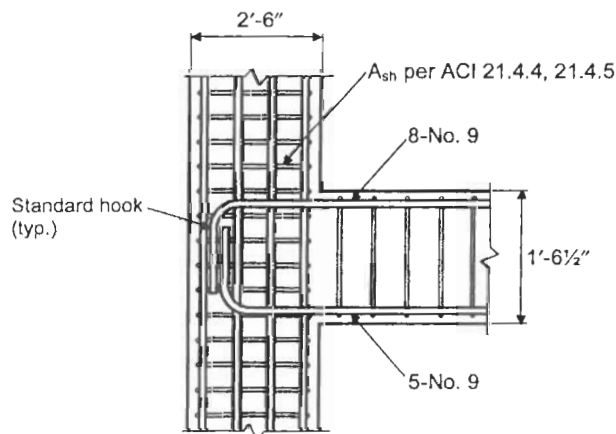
Reinforcement Details at Exterior Beam-Column Joint (SDC D)
